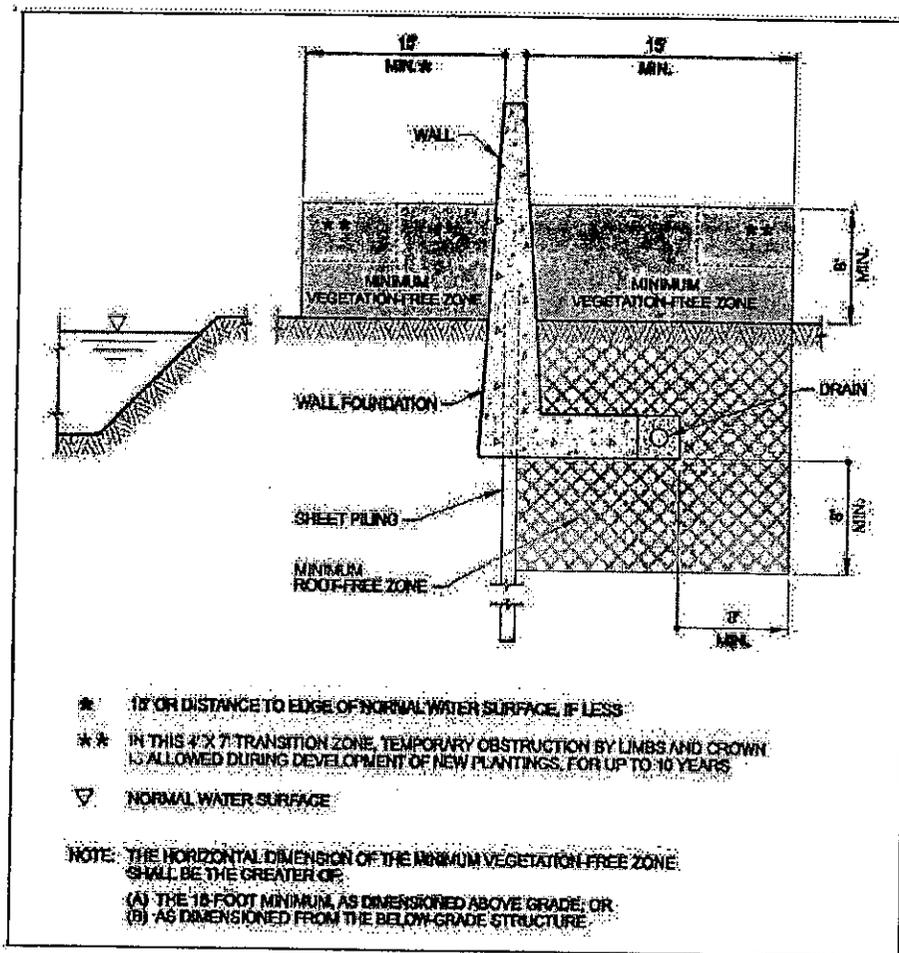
Cantilever-I Type Sheet-Piling Floodwall with Drain.
